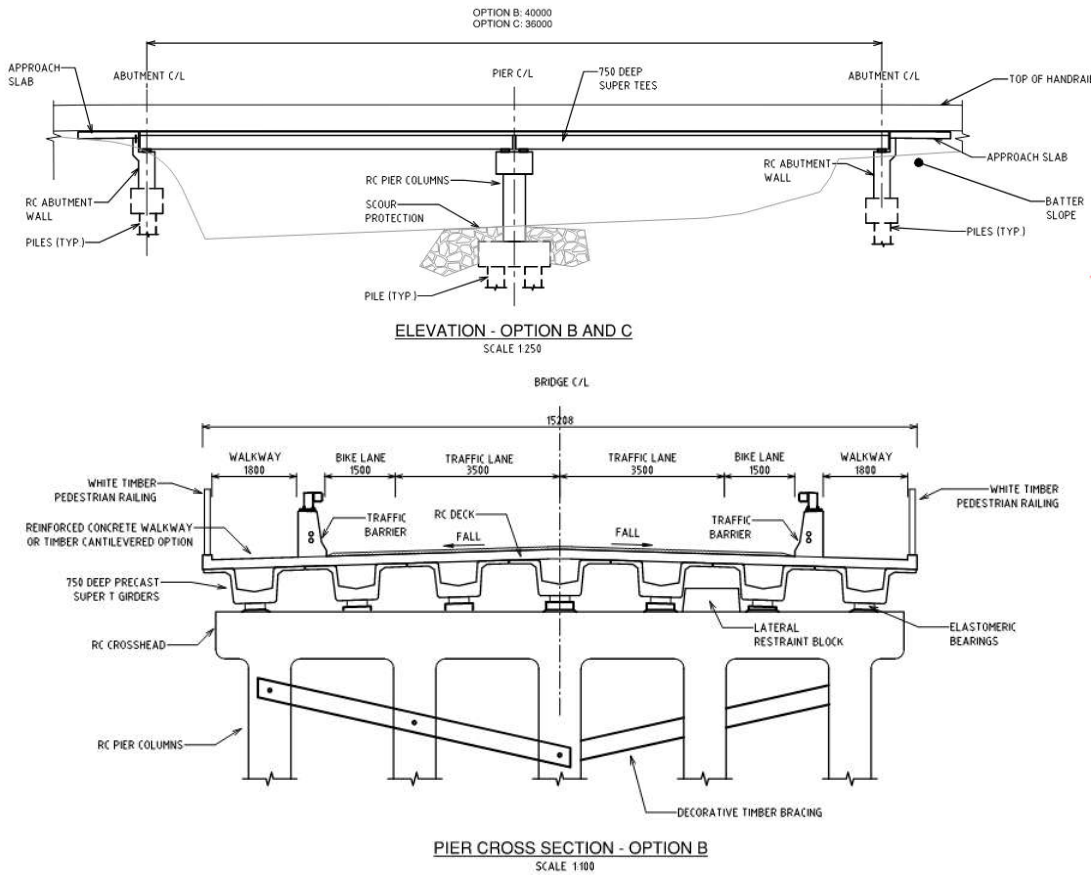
Edwards Bridge Renewal: Option B – Typical elevation and section
